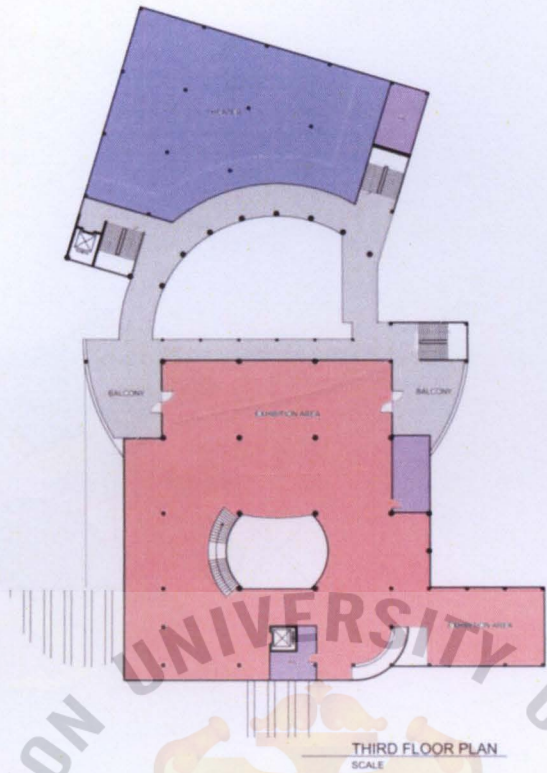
THIRD FLOOR PLAN: ZONING
